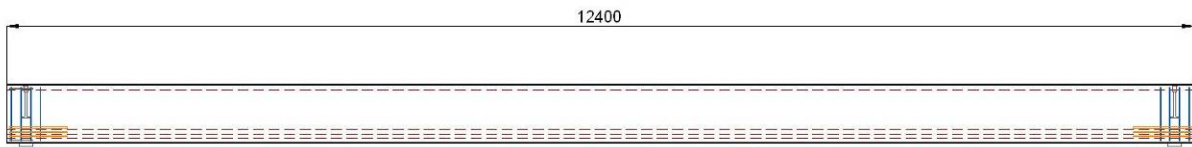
Geometry and reinforcement of the full scale beams AF
